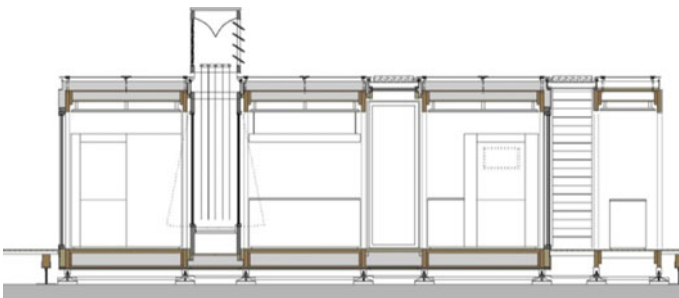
Longitudinal Section (Source HFT Stuttgart)
